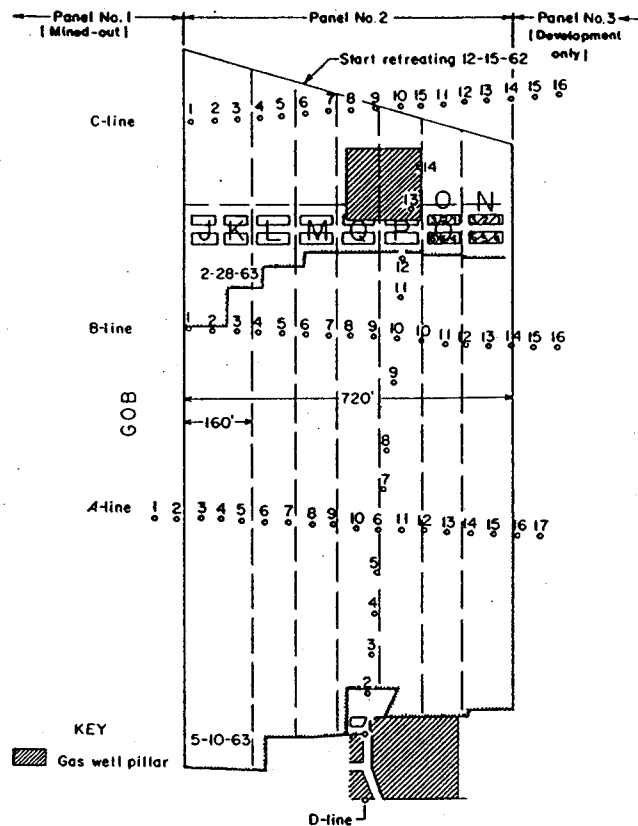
Panel layout and pillar extraction plan - Case 1 (Kohli et al., 1982).
